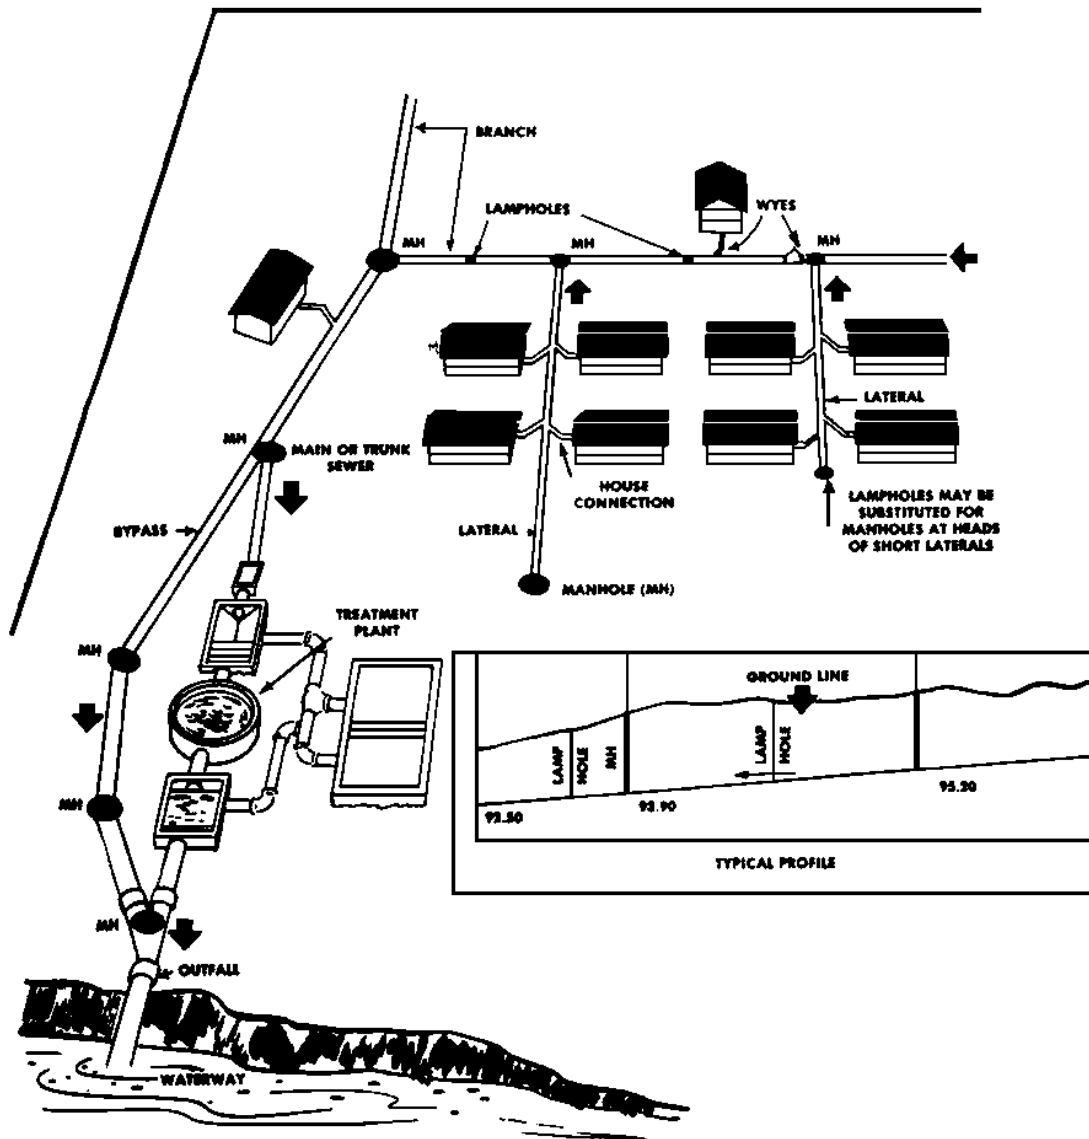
Layout, plan and profile, and nomenclature of sewers.
